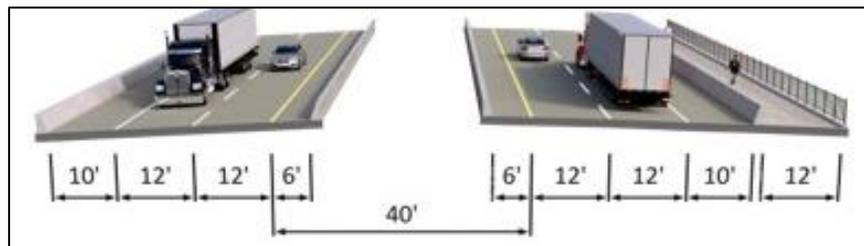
| Build Alternative Bridge Typical Section – S. R. 70 over Indian Prairie Canal C-40
